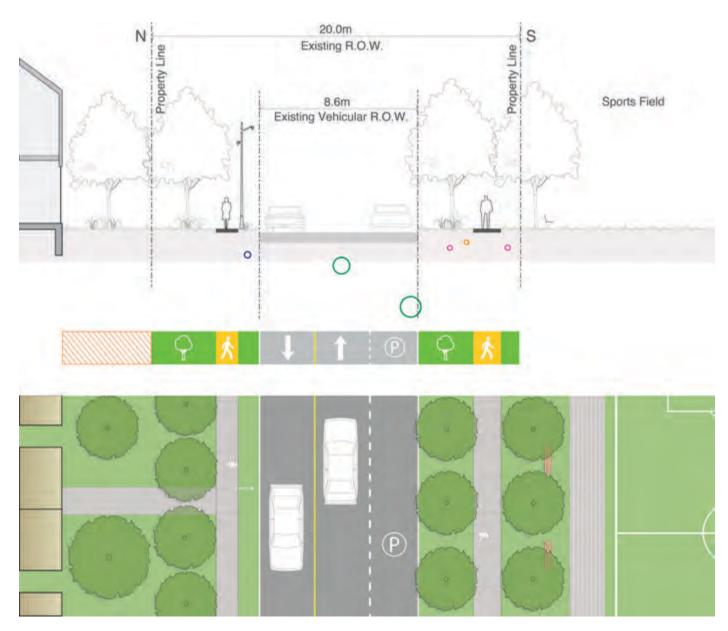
Section and Plan of the Existing Conditions of Keewatin Avenue at sports field
